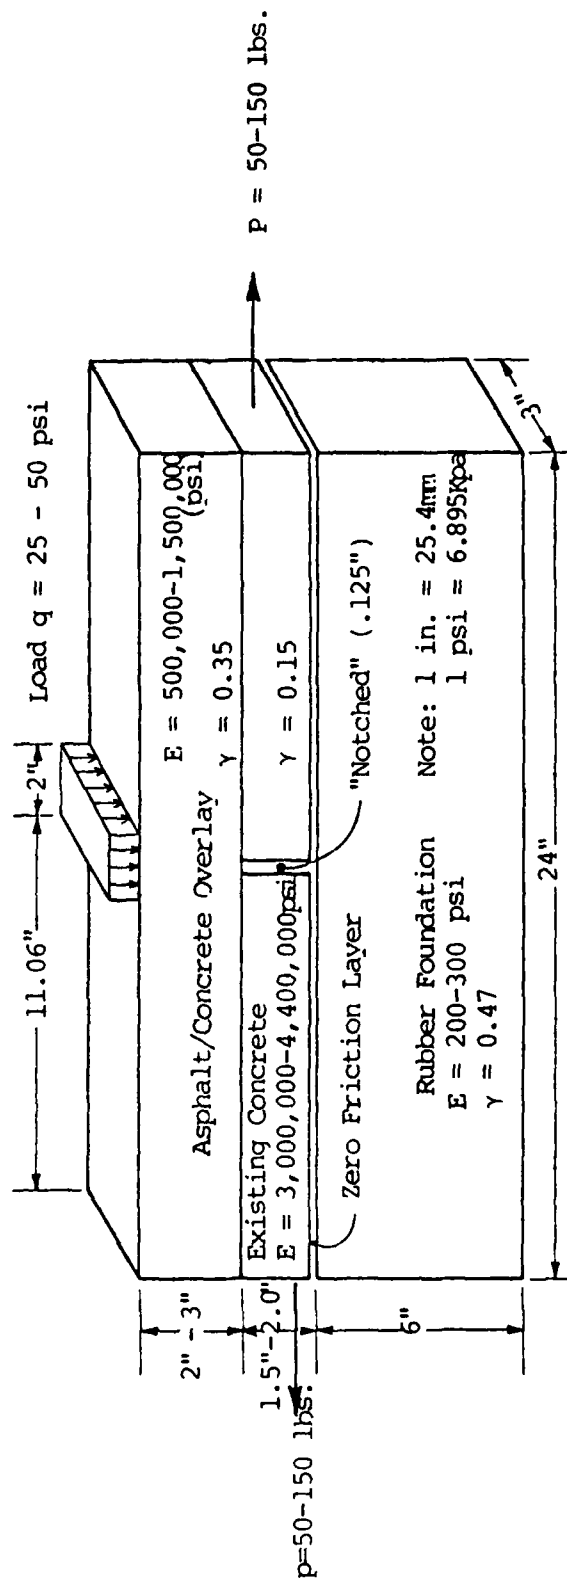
Laboratory Simulation of Overlaid Concrete Pavement.
